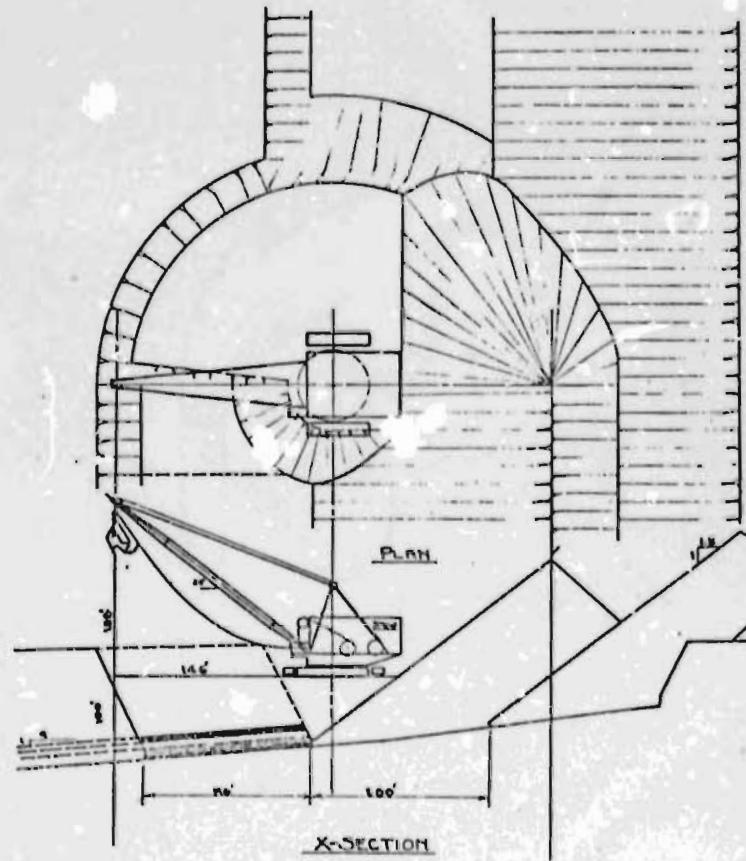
Cross-section and plan for open-cast mining, using the dragline bench method (from Weimar, 1969, p. 9).
